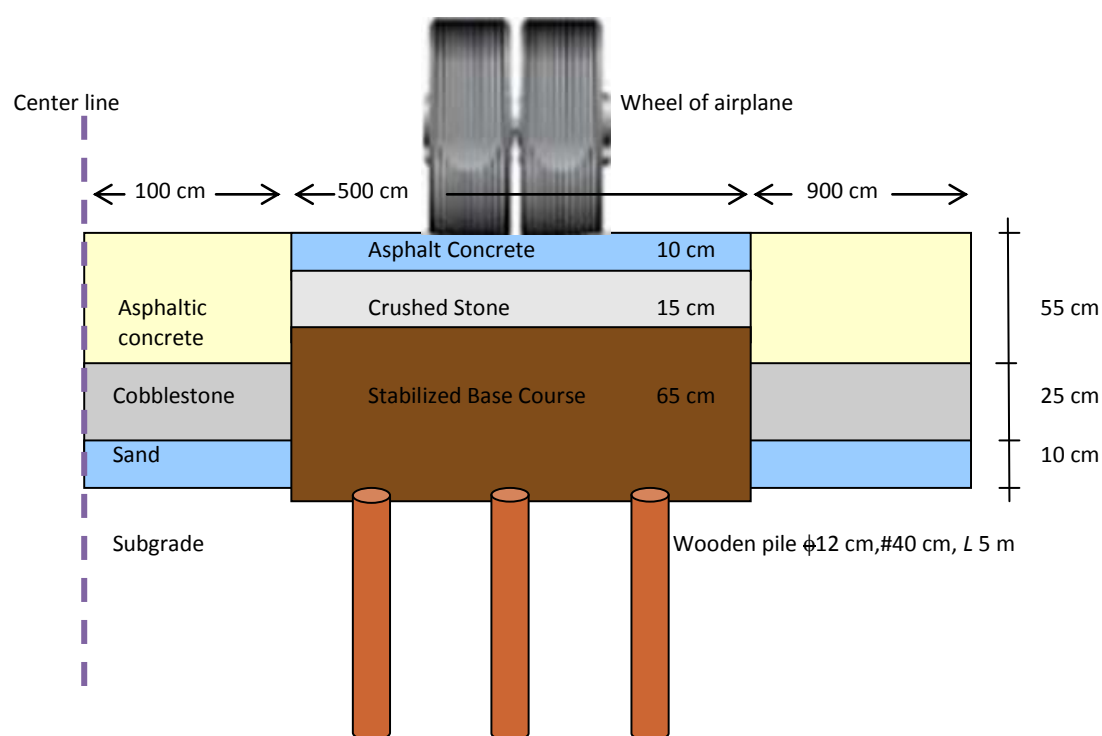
Cross-section of Supadio airport runway (reconstruction pavement in the middle and existing pavement on left-right side)
